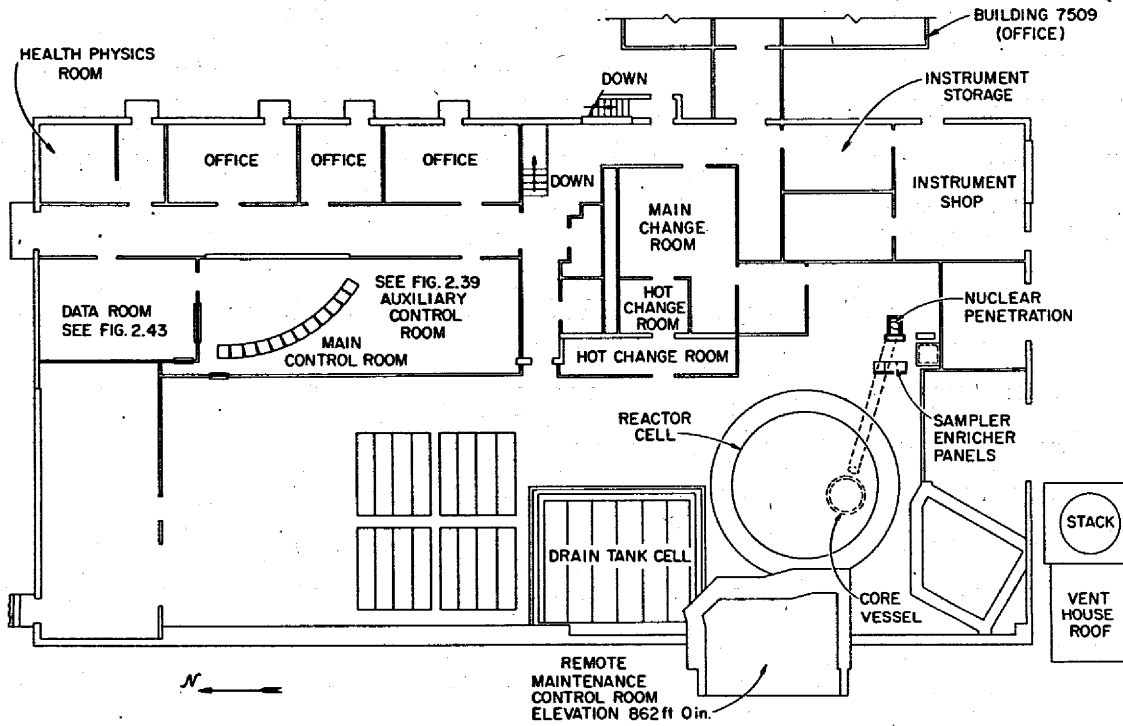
Main Floor Layout of Building 7503 at 852-ft Elevation.
